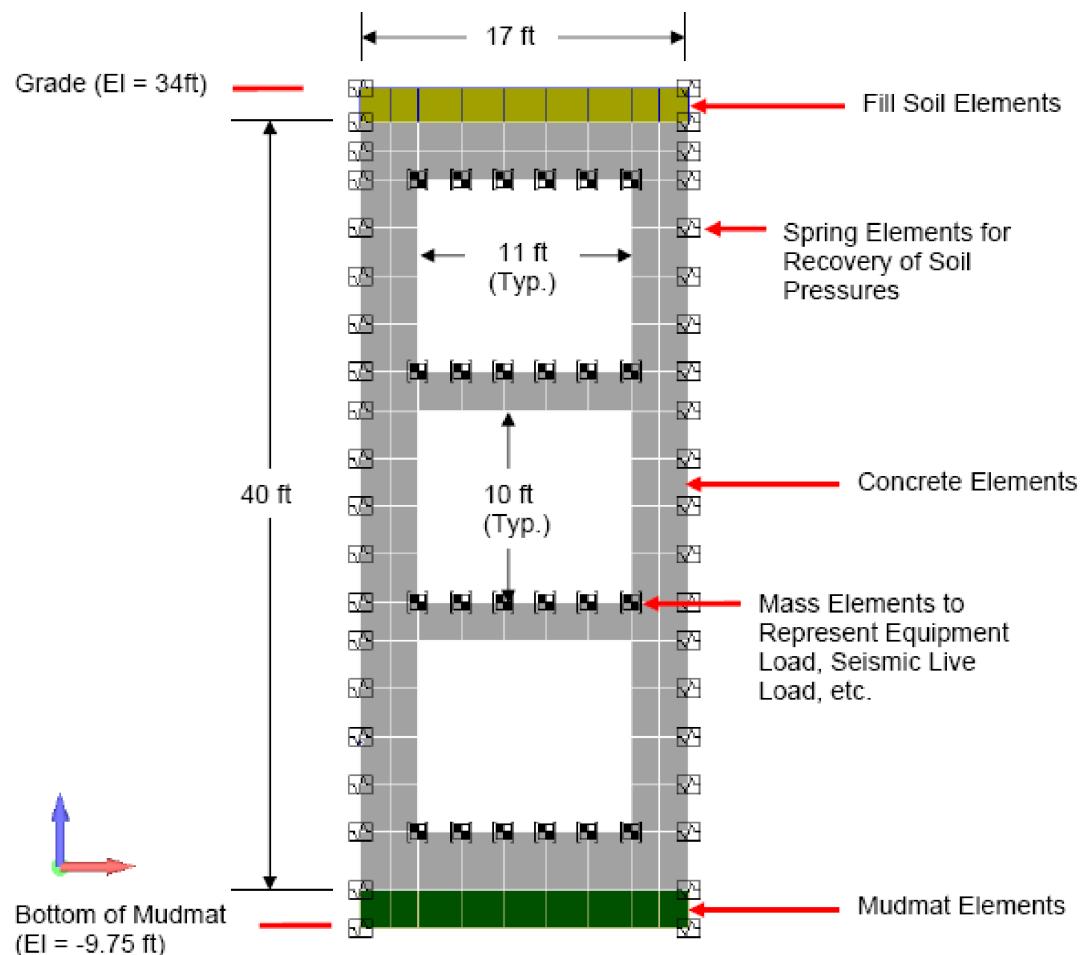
H.6-209 SSI Model of RSW Piping Tunnel
